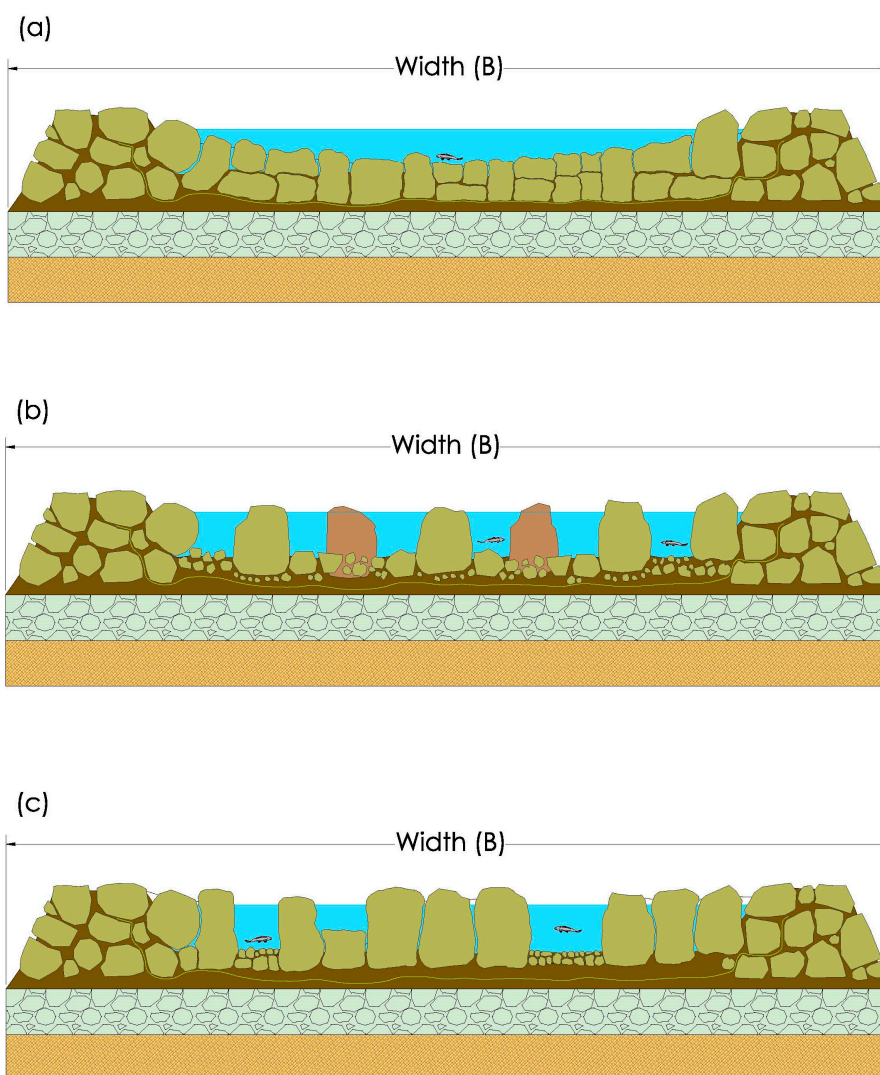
(a) Cross-section of a semi-dry roughness ramp [R-r-sd]; (b) Cross-section of a boulder ramp with concrete slab and sidewalls [R-bl-c]; (c) Cross-section of a pool and weir system with concrete [R-pw-c].
